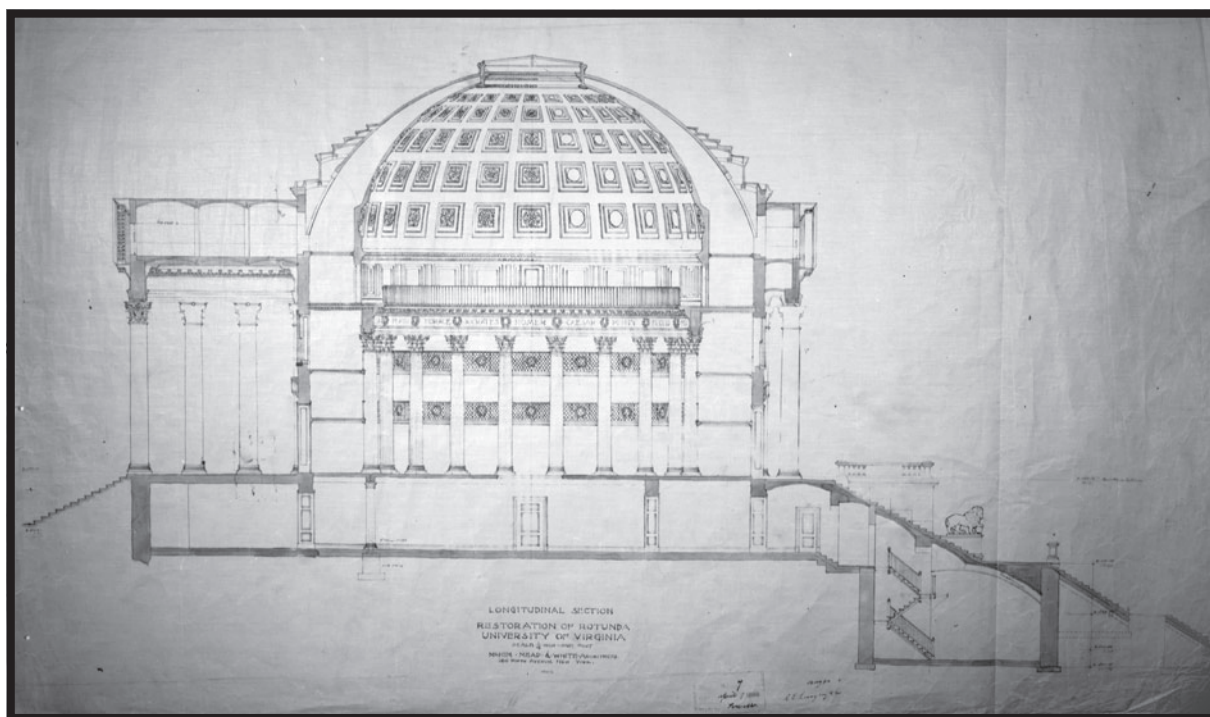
McKim, Mead and White, building section looking west, April 9, 1896.
